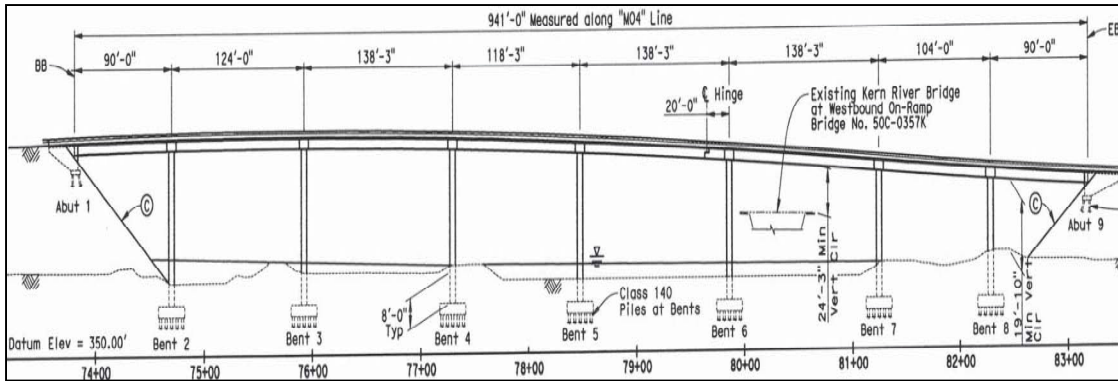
Profile of Bridge at Mohawk Street (Alternative B)
